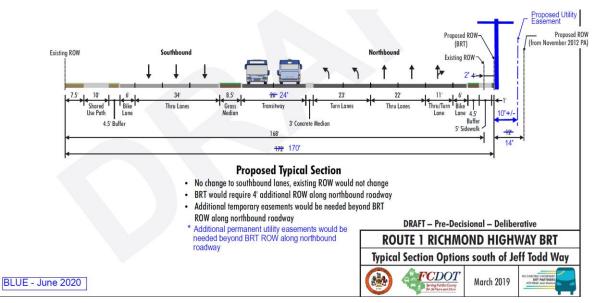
Proposed Typical Section at Mount Vernon Highway from June 11, 2020 FCDOT Meeting
